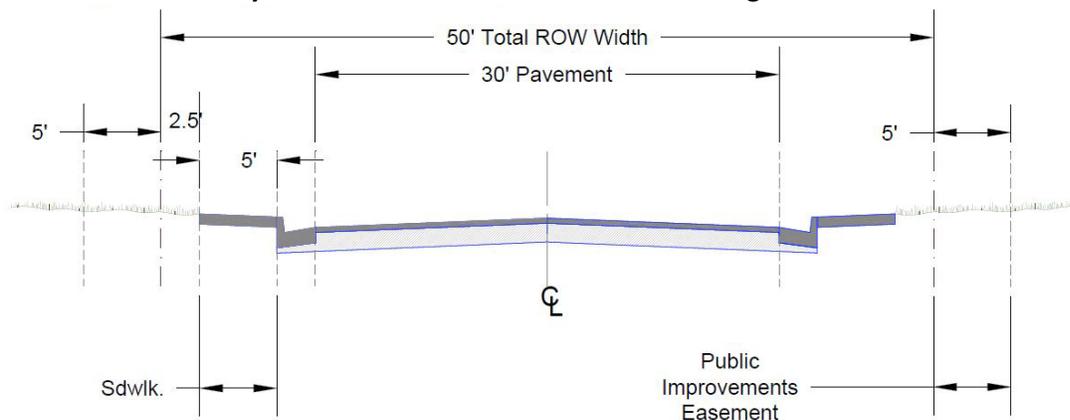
of the ECM requires a 50-foot right-of-way containing a 2.5-foot buffer from the back of sidewalk to the edge of the right-of-way and an additional 5-foot utility easement outside of the total right-of-way width. The street section is modified to measure 45 feet from back of sidewalk to back of sidewalk. The modification reduces the ROW width and eliminates the 2.5-foot buffer on either side of the sidewalk and accommodates the site constraints, provides additional open space throughout the project, and provides the 175-foot ECM prescribed intersection centerline spacing along Running Deer Way. A 30-foot pavement width is maintained as well as the 5-foot utility easement.
